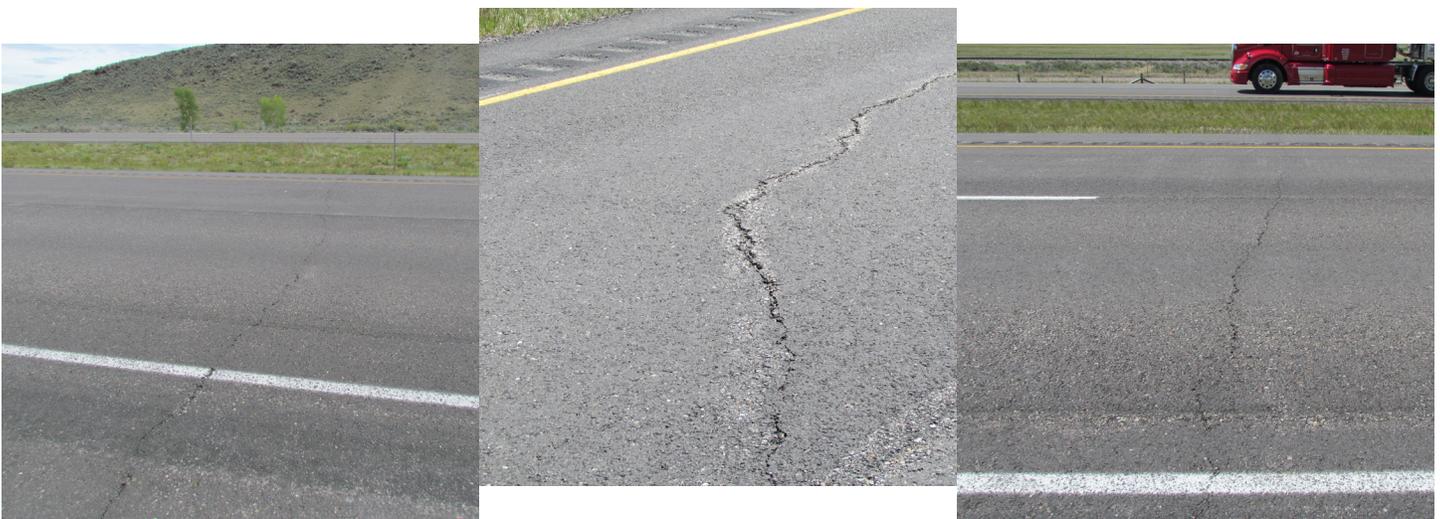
Examples of surface cracking in hot mix asphalt pavement in southbound lanes (left), warm mix asphalt pavement (center), and hot mix asphalt pavement in northbound lanes (right)
